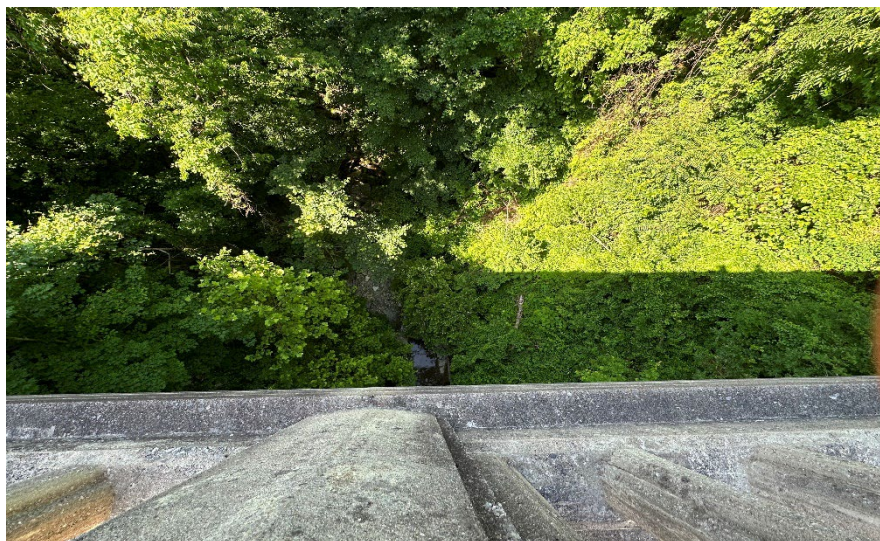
Facing southwest, downstream, looking down at Little Crooked Creek from the center of the bridge.
